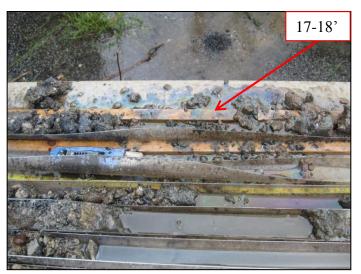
Silt and sand observed in SB-5. Typical in borings throughout project site.
